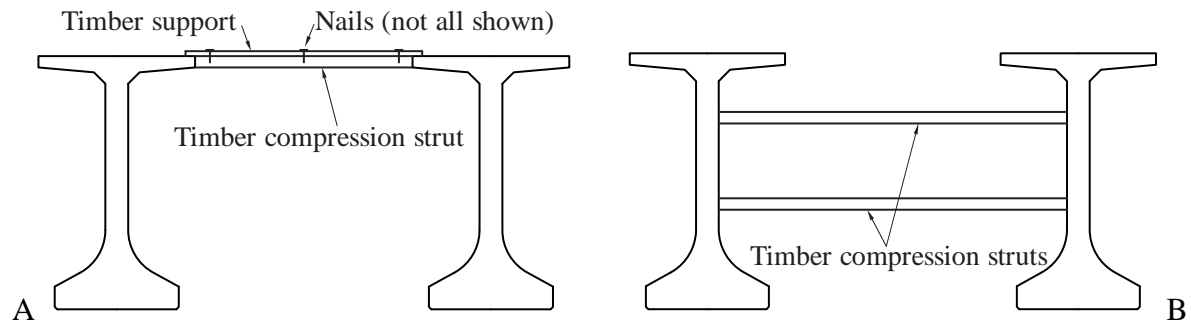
Examples of strut bracing. A) top strut. B) parallel struts.
